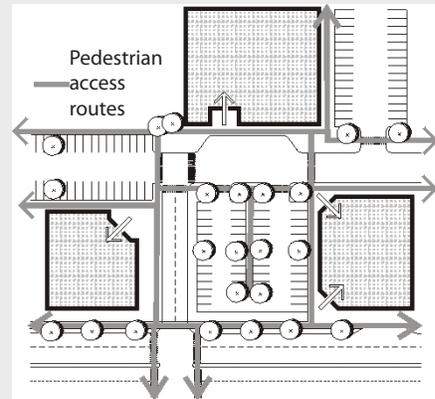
An example of an integrated pedestrian circulation system. Note the connections from the street, between buildings, through parking lots, and to adjacent sites.
